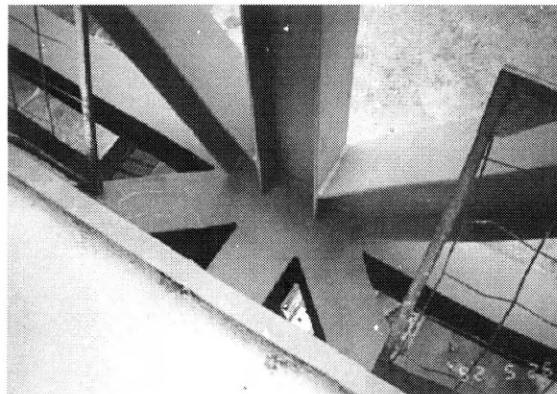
moment connection used in the steel bridge linking the two wings of the Ottawa City Hall extension
